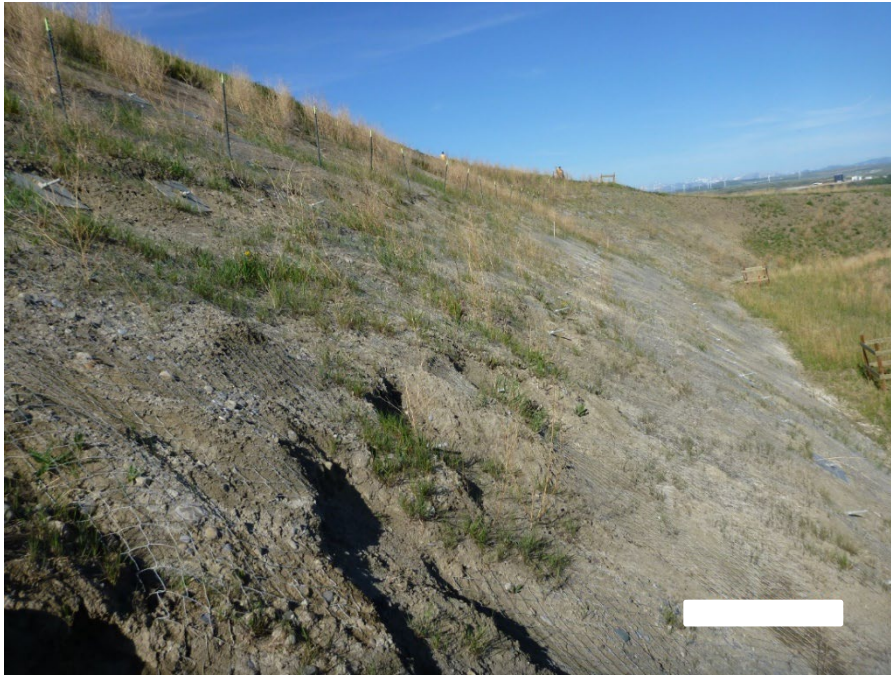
Rill erosion and sloughing on the slope surface near the east extent of the site. Some of the anchor plates have been covered by sediment. Photo taken May 28, 2025, facing south.
